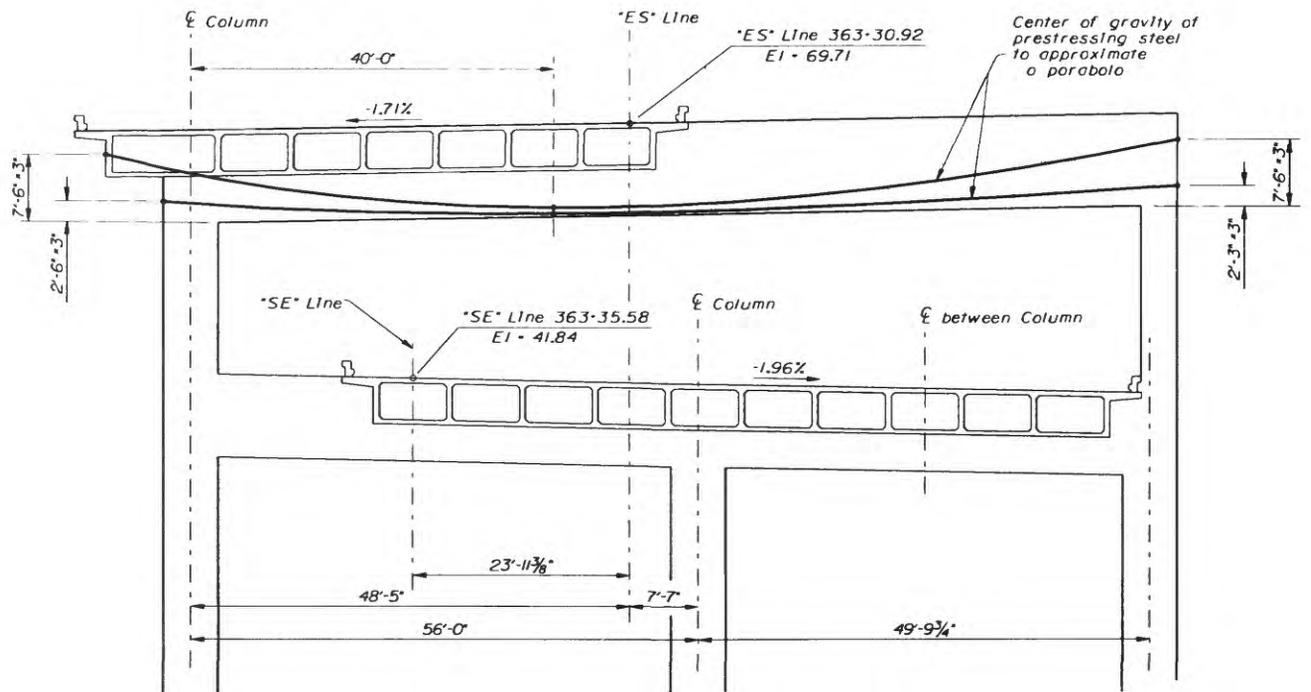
Section drawing of Bent 48 at Southern Freeway Viaduct.
